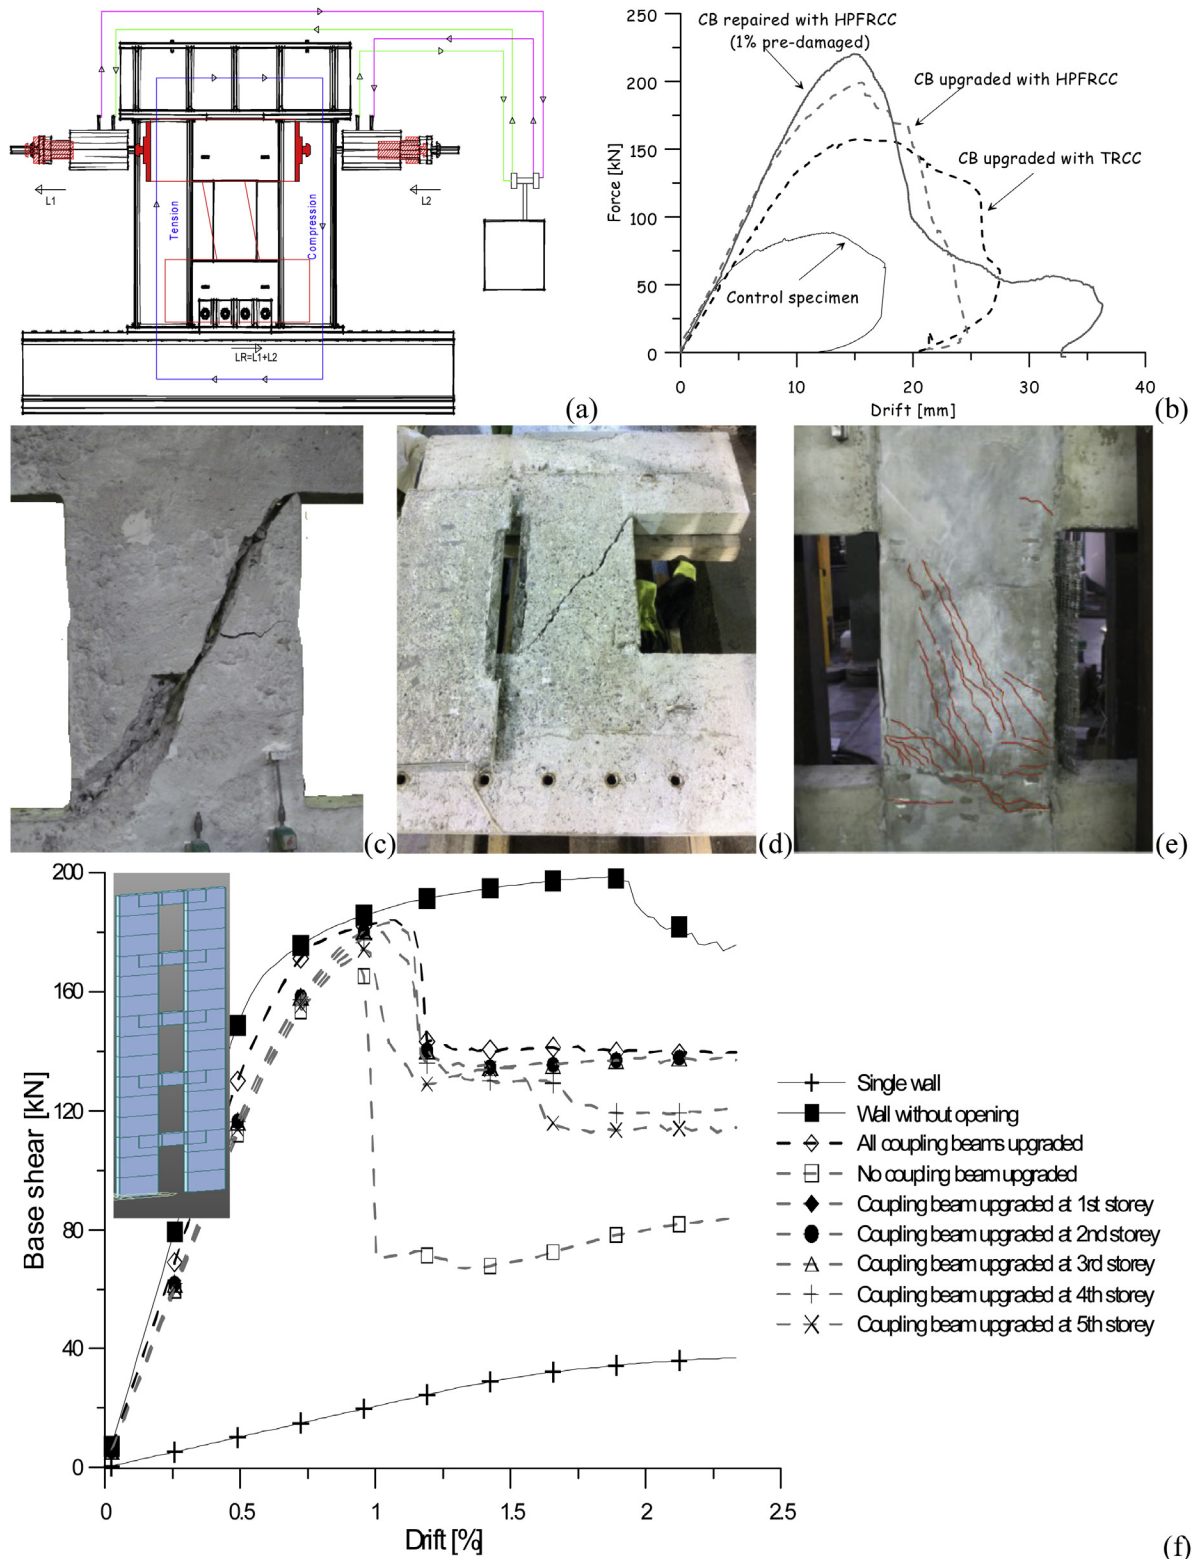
Retrofitting of shear wall coupling-beams with HPFRCC: test set-up (a); load vs. drift performance for reference and retrofitted/upgraded mock-ups (b); diagonal cracking in an unreinforced beam(c) and in the unreinforced subgrade of a retrofitted one (d) as compared to multiple cracking in the retrofitted layer (e); and numerical push-over curves for different retrofitting options, as compared to the performance of uncoupled two-shaft wall and monolithic wall [66].
